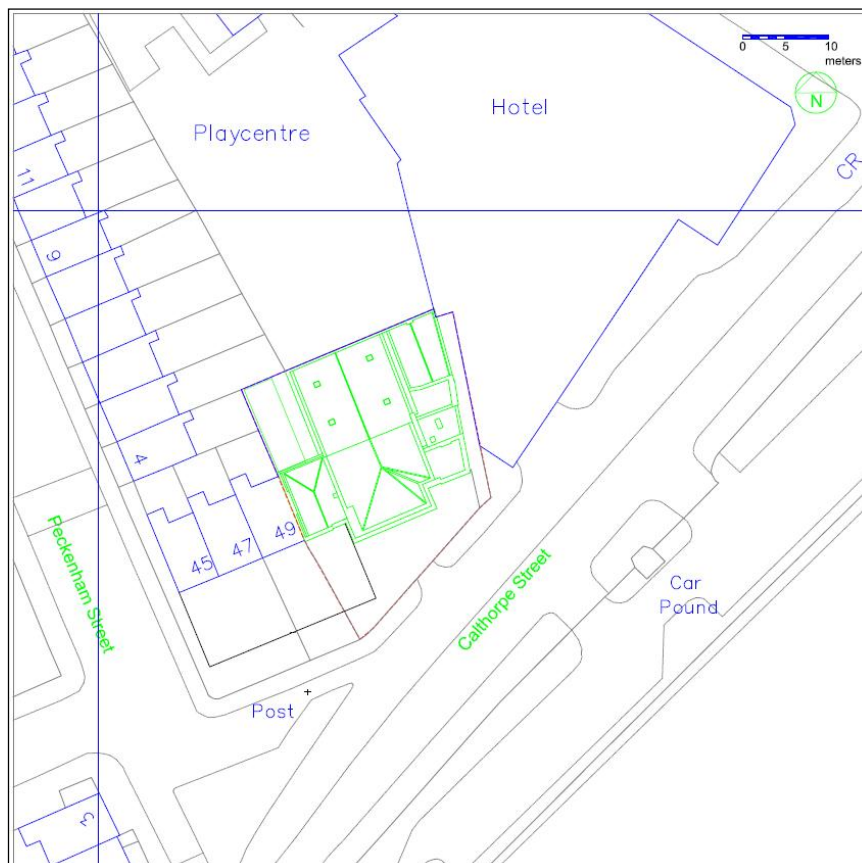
Site Location Plan, 51 Calthorpe Street, Camden
